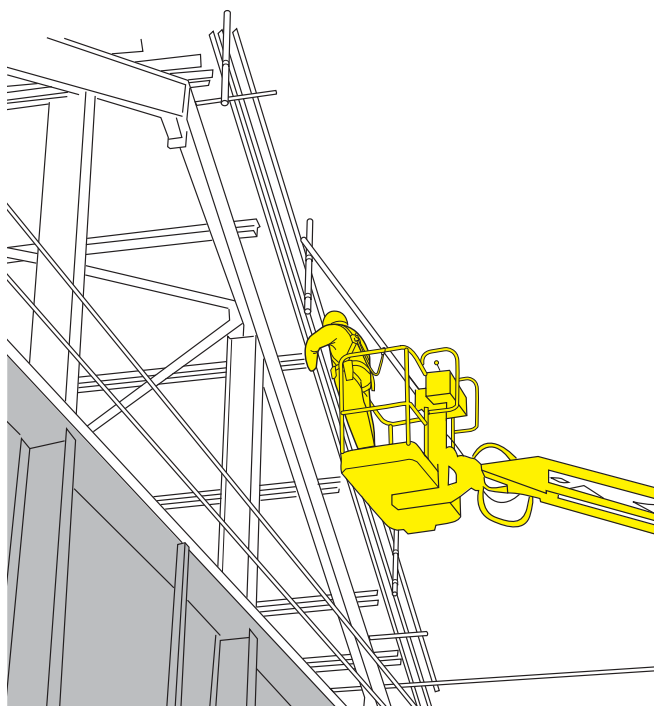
Scaffolder erecting roof edge protection from a MEWP.
